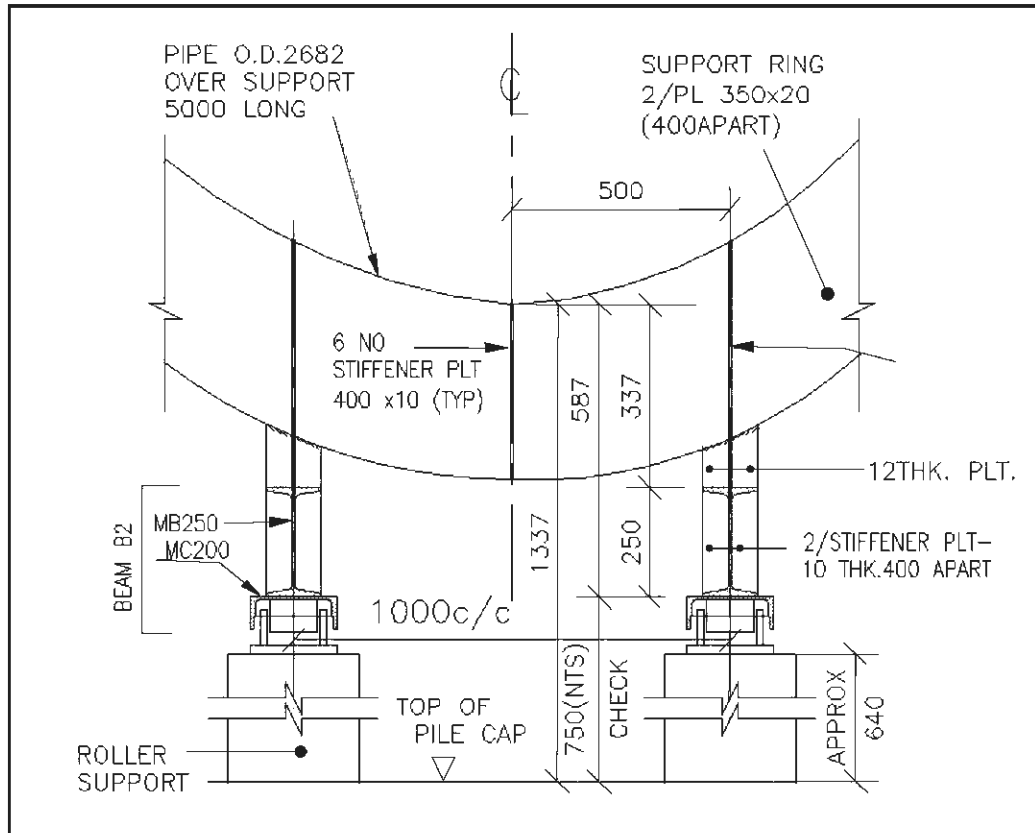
Details of Pipe Attachment for Rolling over Pile Caps (At support)
